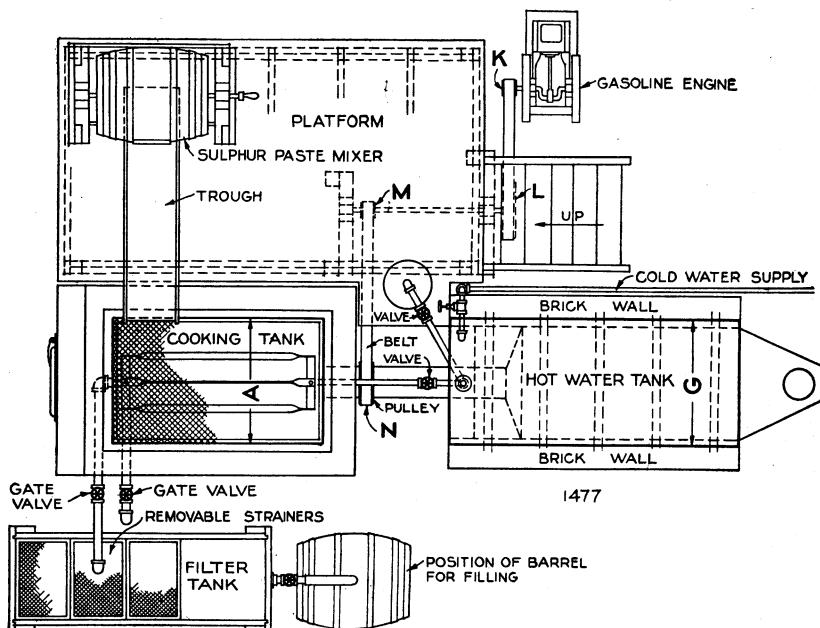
Plan of single-cooker furnace type of lime-sulphur plant.
